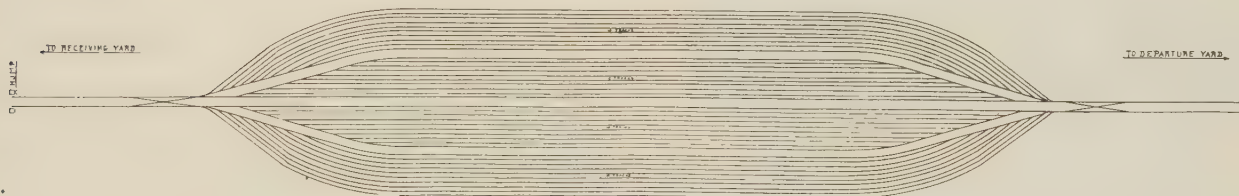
TYPICAL LIGHTING OF A 3200-FT. YARD WITH TOWERS CLOSE TO HUMP
